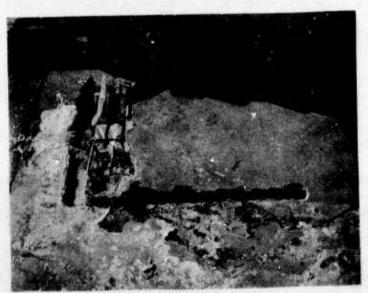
In-situ specimen, test 15, in sandstone near Park City, Utah.
